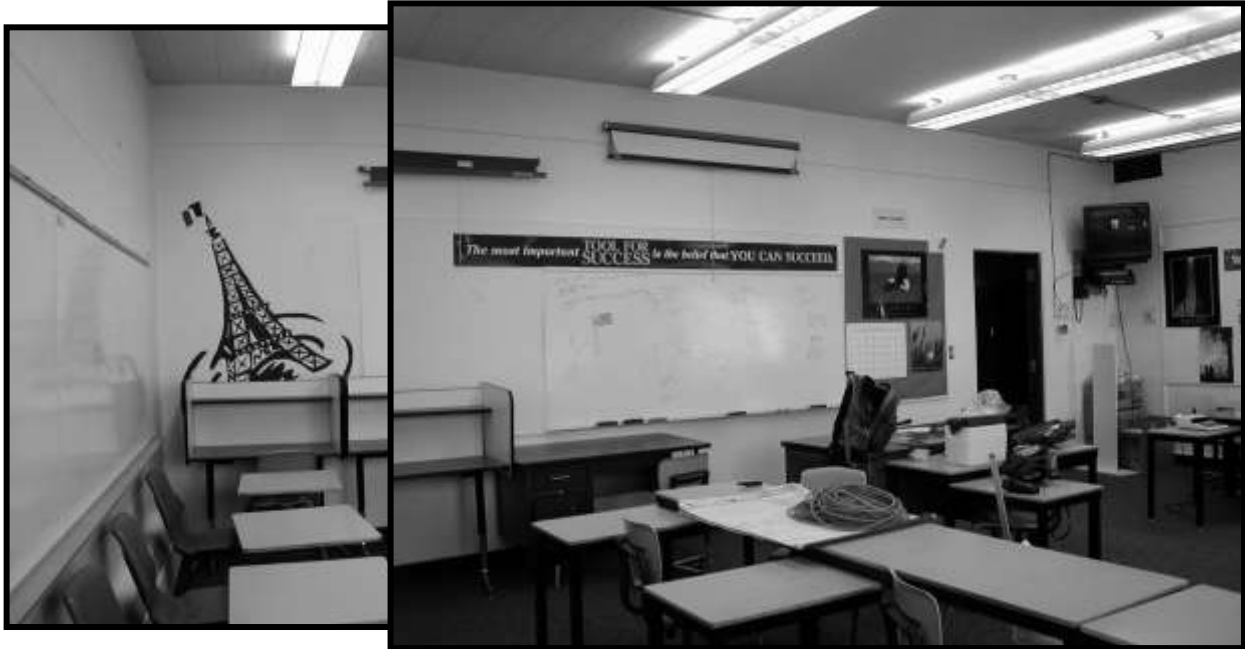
West wall of Class Room 117. Note whiteboard across much of the wall. Note indented line from left to right high on the wall. Note heat vent above television, upper right.
